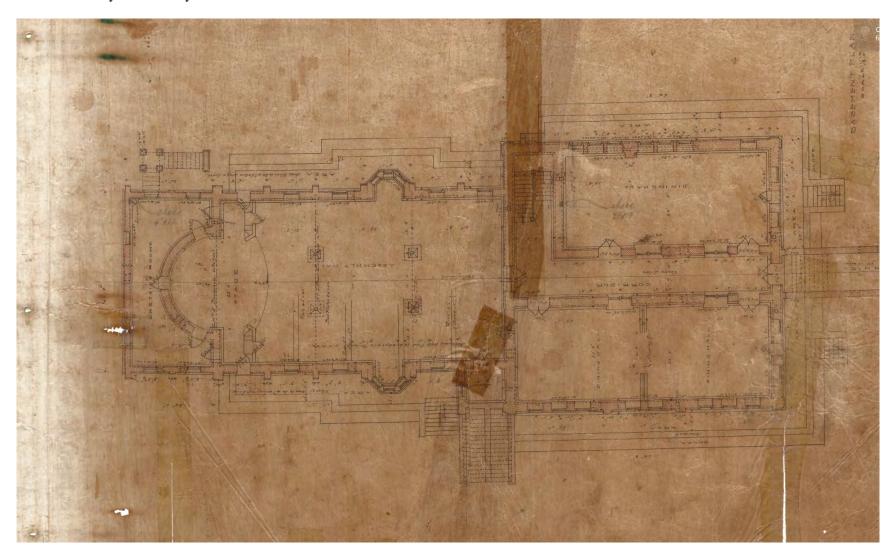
James Wahrenberger, Reinbolt Hall Construction Drawings, First Floor Floorplan, 1908 Source: St. Mary's University Archives
